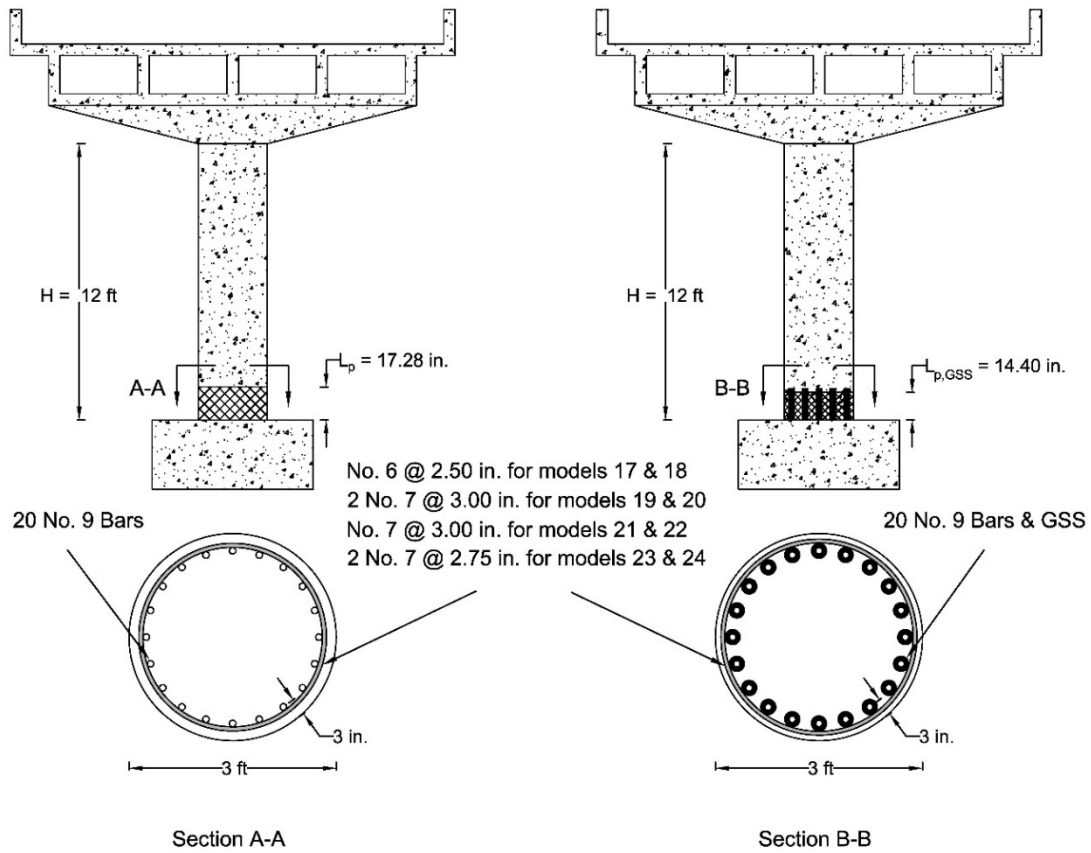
Details of column models with $H = 12$ ft and 20 No. 9 bars.
